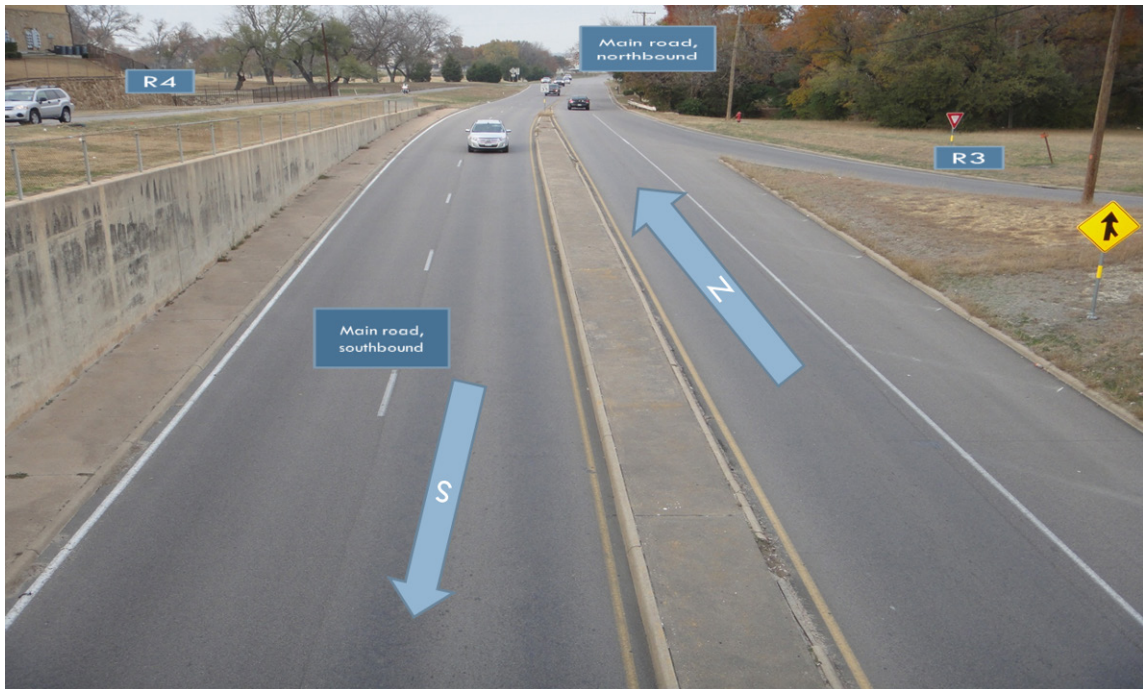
Photo of Pumphrey Street Sections (taken from overpass, facing north).
